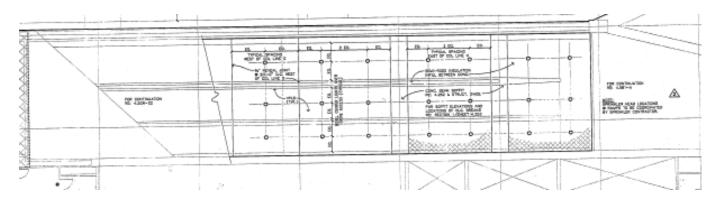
14th Street North Ramp Reflected Ceiling Plan – B1 Level
